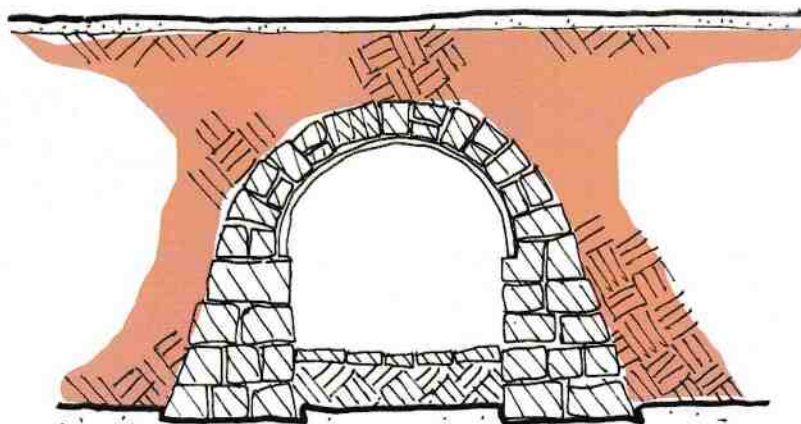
Large culvert – masonry arch with corrugated iron formwork
